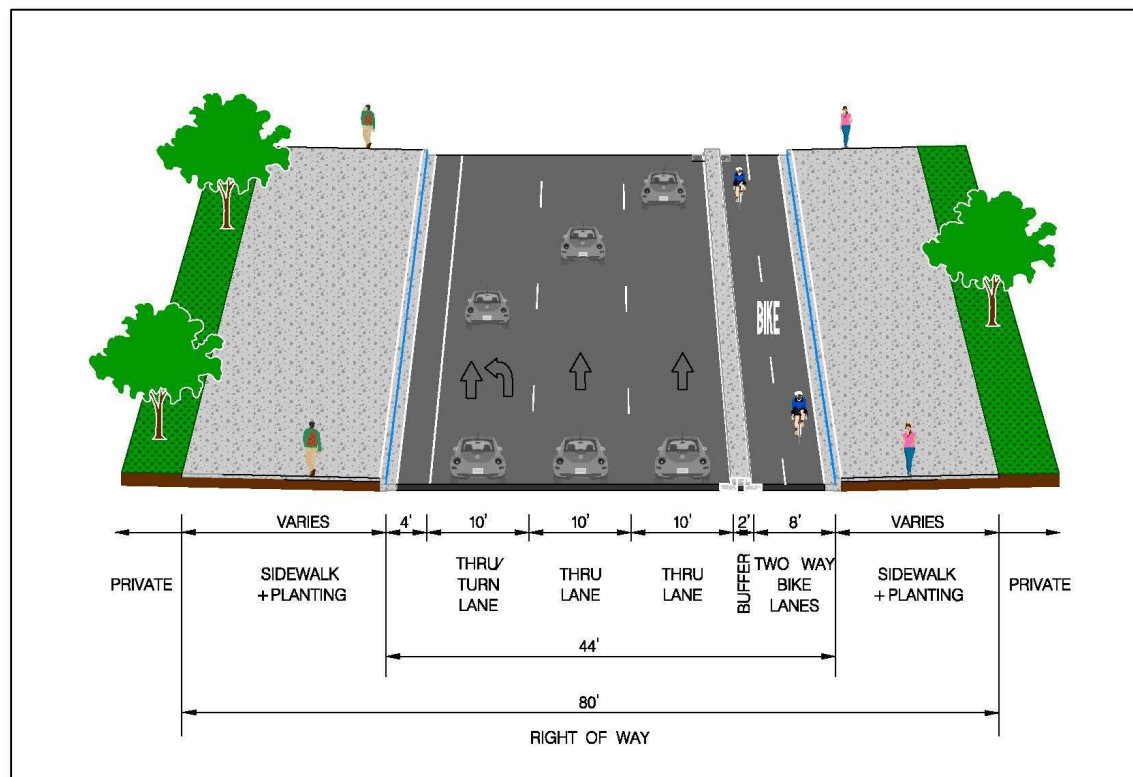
Proposed Old Georgetown Road Typical Section from Commerce Lane to Wisconsin Avenue
